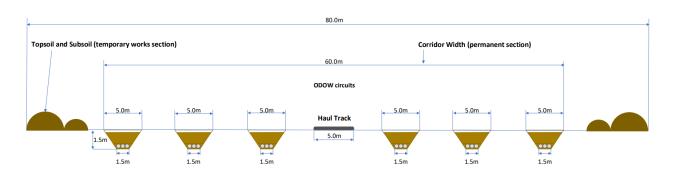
Example onshore cable construction corridor cross section for 6 HVAC cable circuits (18 cables)
